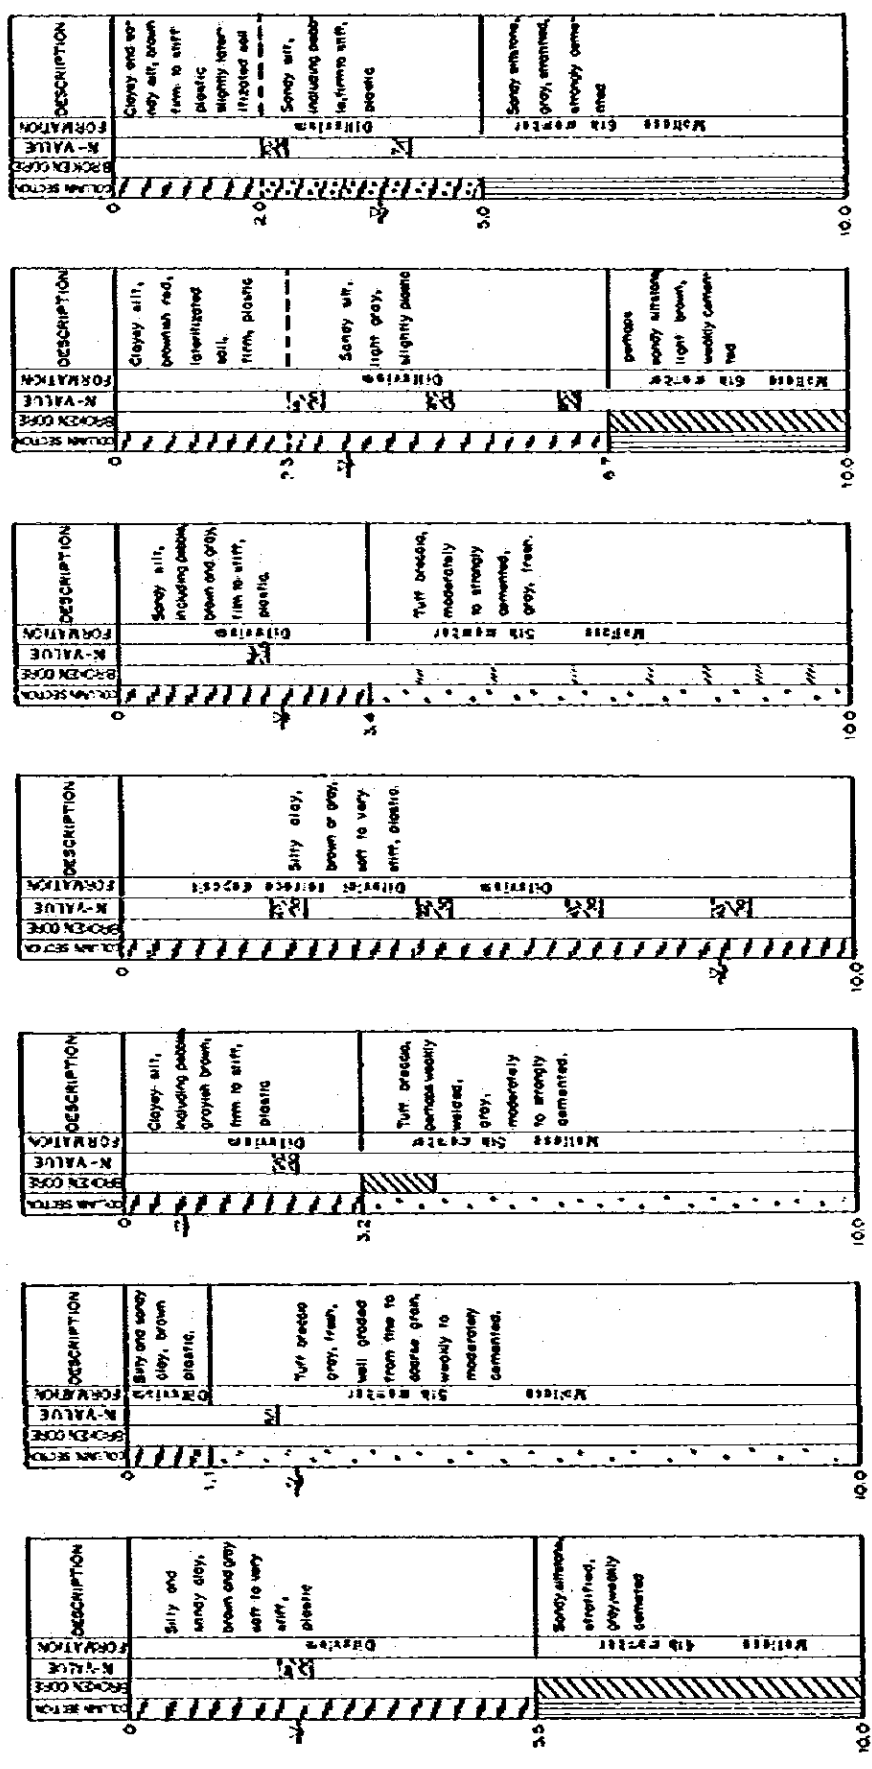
SUMMARIZED COLUMN SECTION OF AMING SECONDARY CANAL (3/4)
